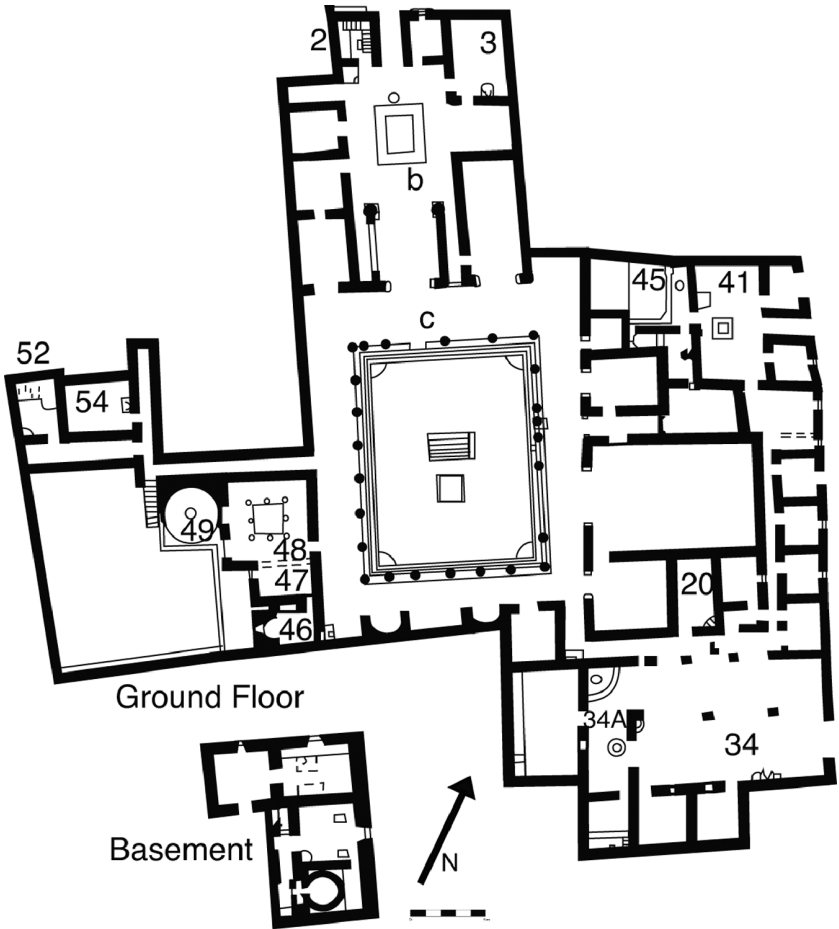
Plan of the House of the Menander (House I.10.4)
